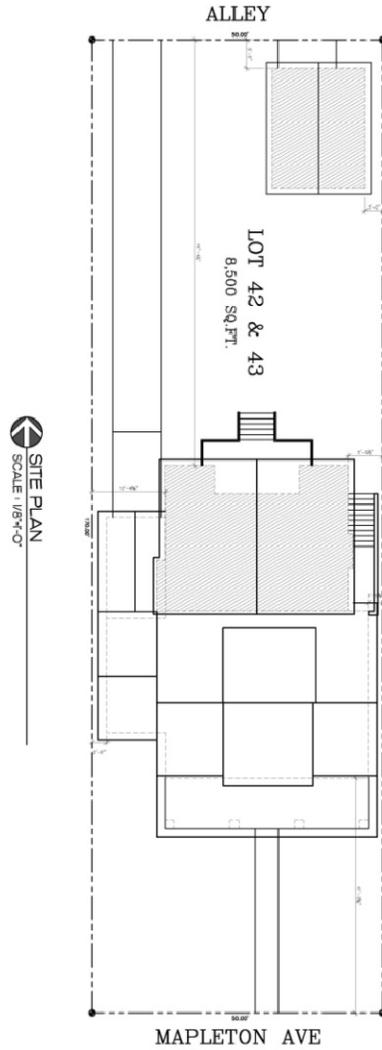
Proposed Site Plan, Dec.3, 2014 (right). Not to scale.
